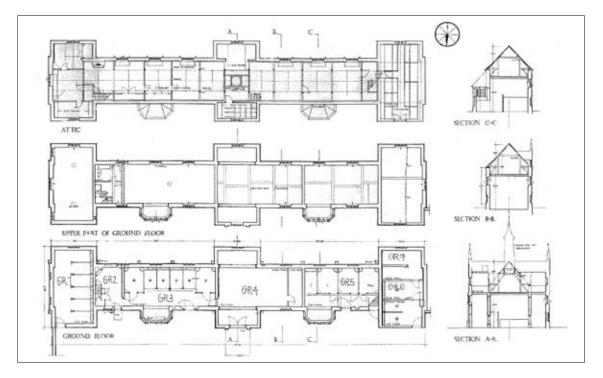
Plan and cross-section of the stable building prepared by the Ministry of Public Building and Works, Ancient Monuments Branch, showing the six stalls since removed from the east crosswing. Surveyed 1961, updated 1981. © English Heritage
